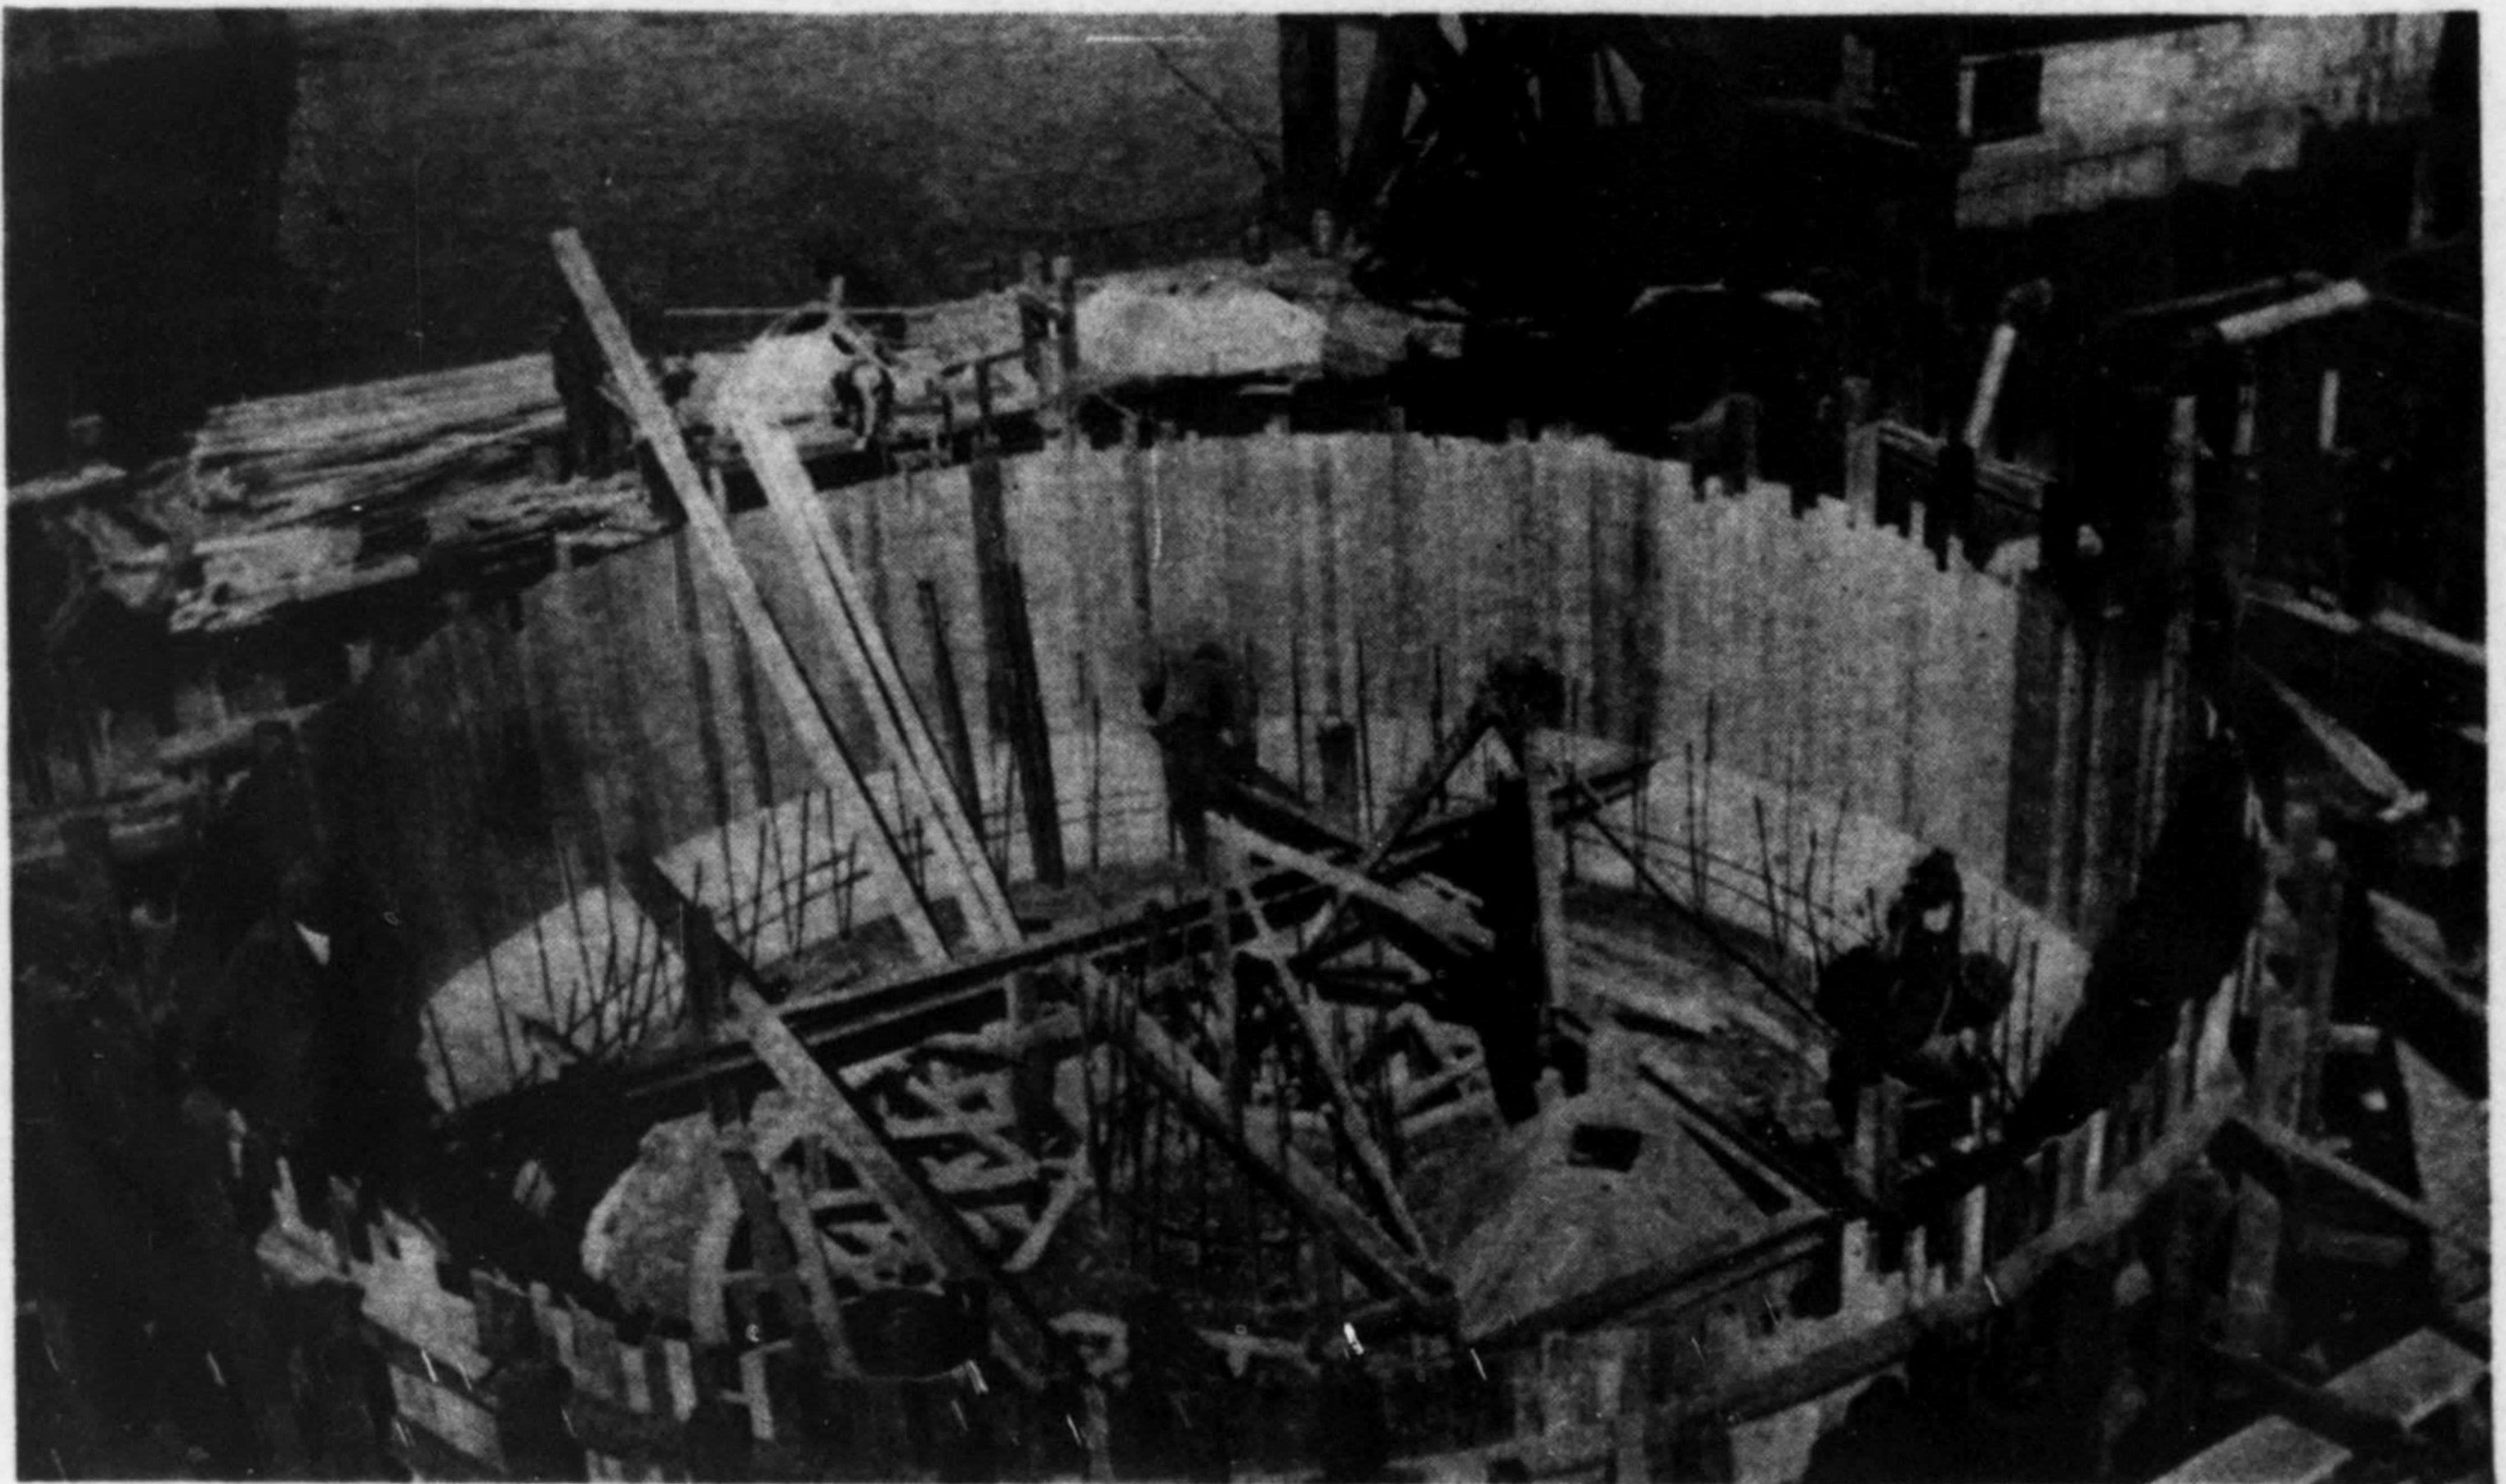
PIVOT PIER of Chicoutimi Bridge under construction within the cofferdam formed by the protection pier.
